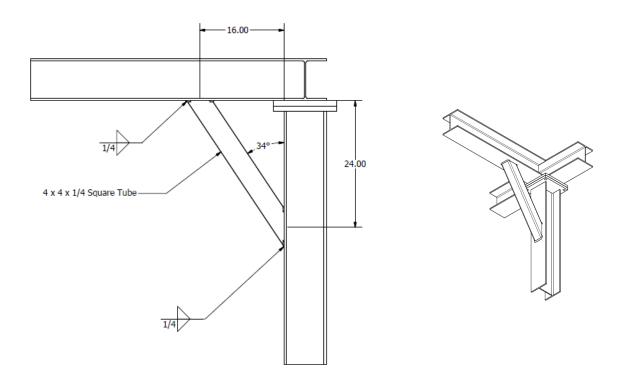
Recommended bracing between the cross beam and column at the upstream locations.
